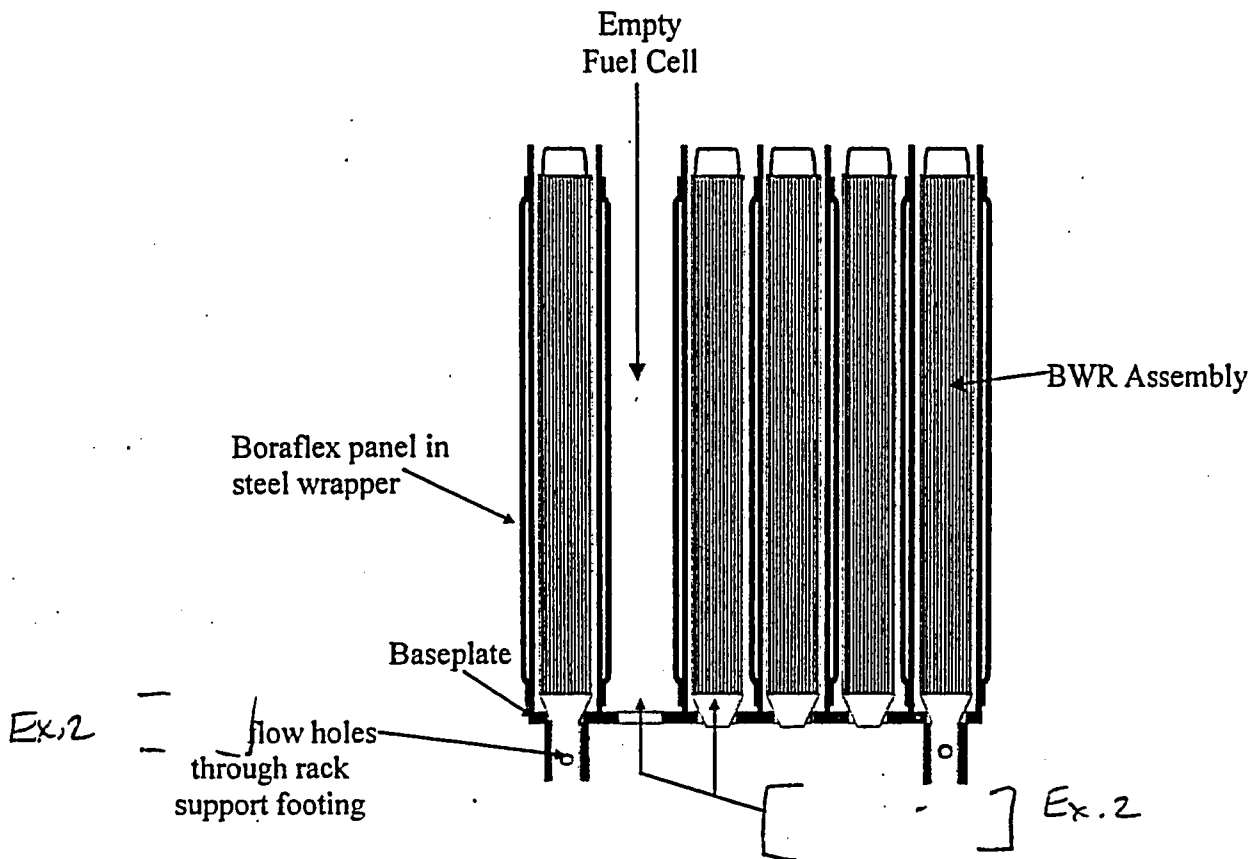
Typical Spent Fuel Pool Rack Cut-away Cross-section Showing the Fuel Assembly.
